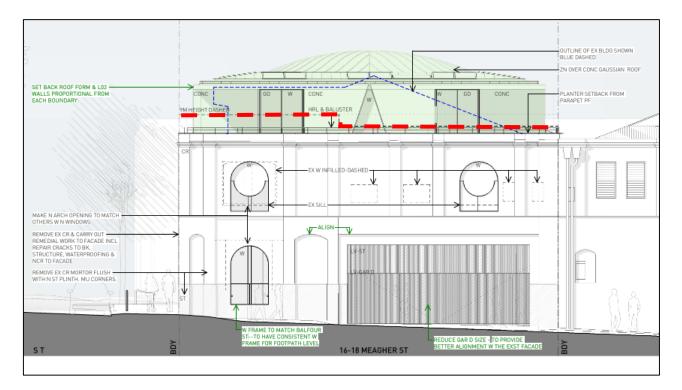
Eastern elevation showing the 9m height control and existing roof form dashed
